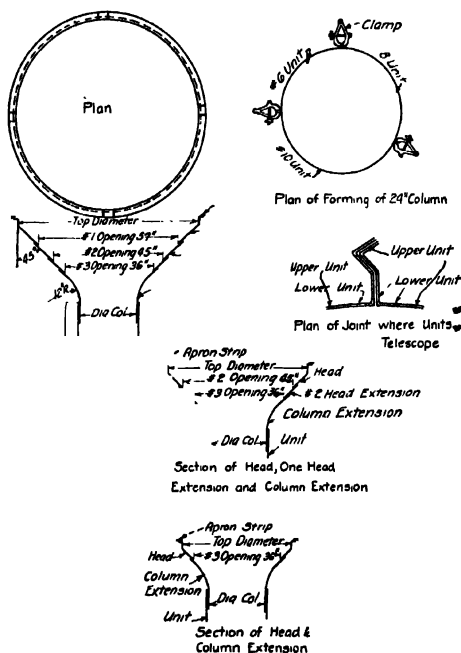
Steel column forms—Hydraulic Pressed Steel Co.
